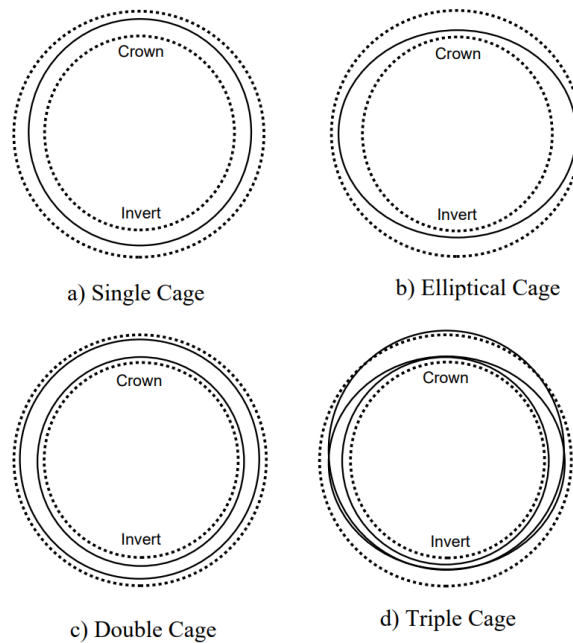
Reinforcement configuration for concrete pipes (adopted from Ramadan et al. (2020b) and Wong & Nehdi (2018))
